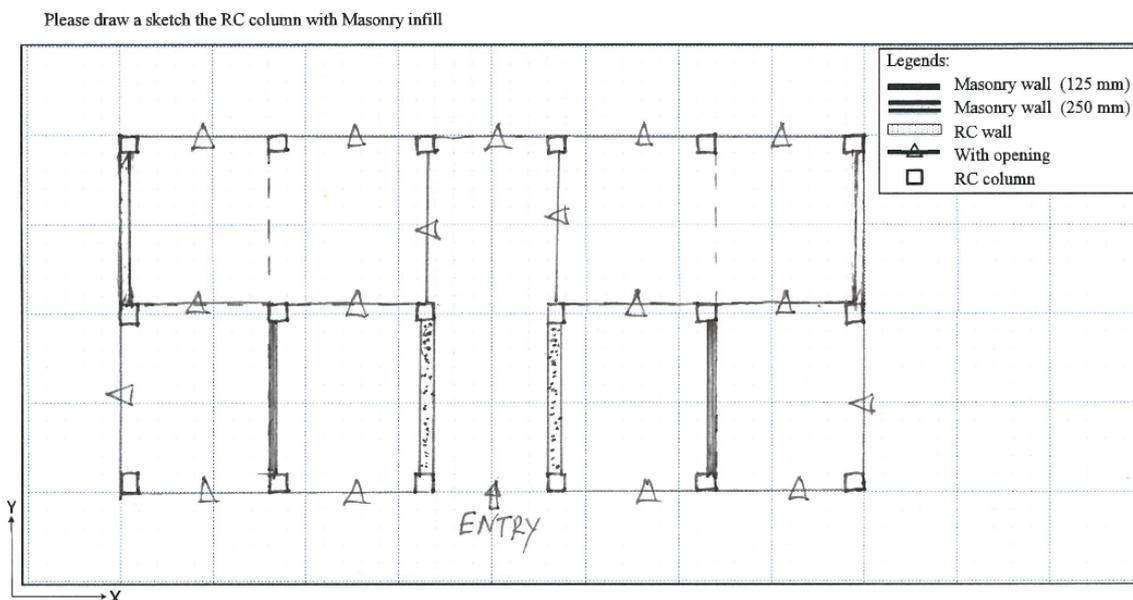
Rough sketch of the building showing Column layout and masonry walls with/without opening
